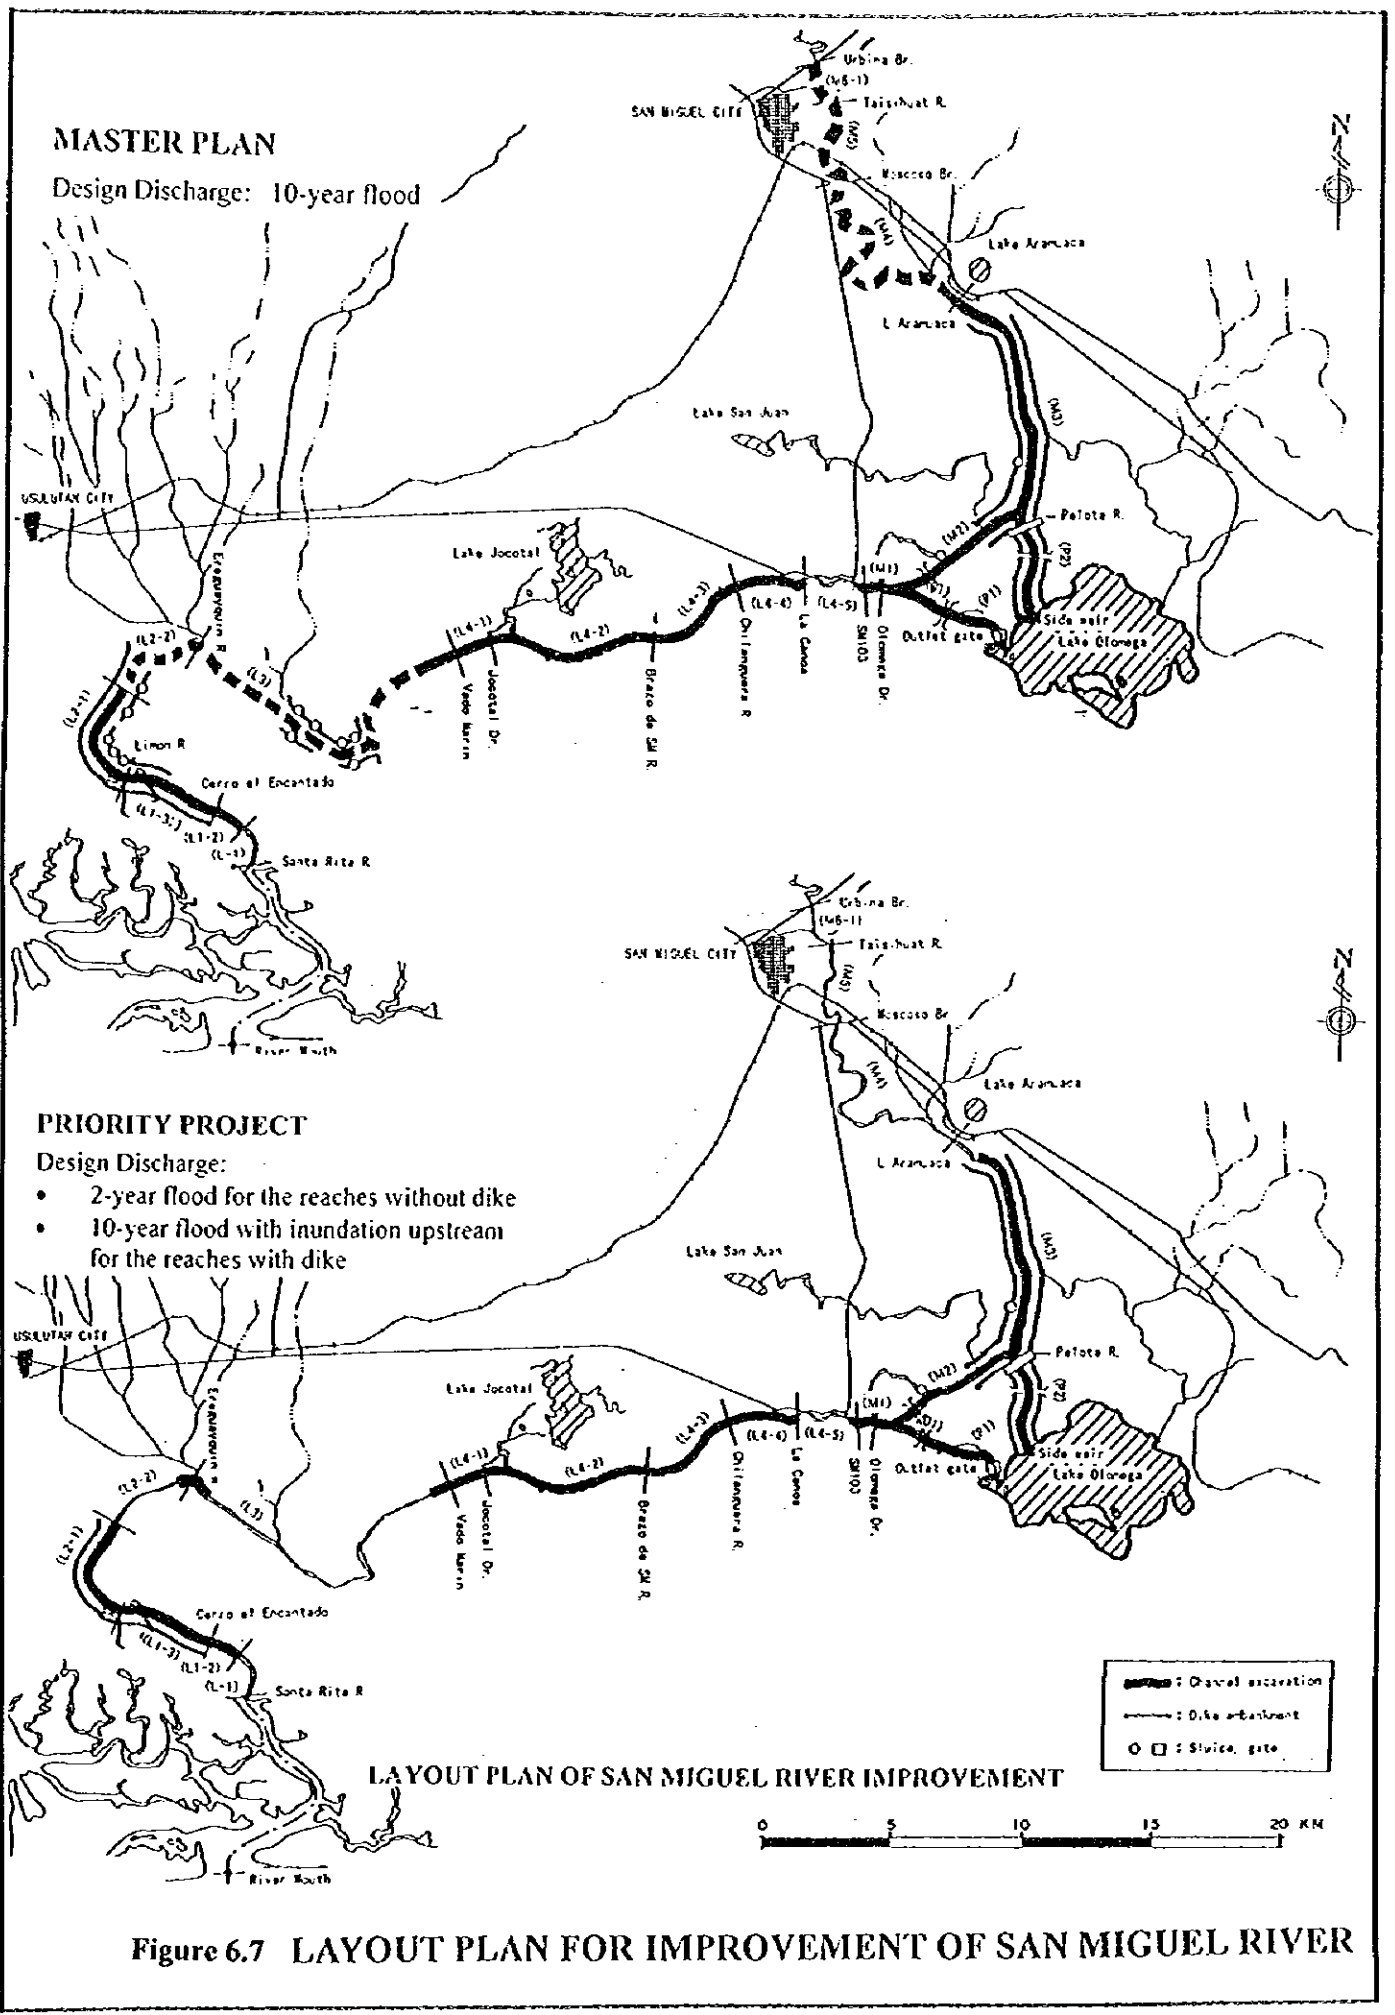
LAYOUT PLAN FOR IMPROVEMENT OF SAN MIGUEL RIVER
